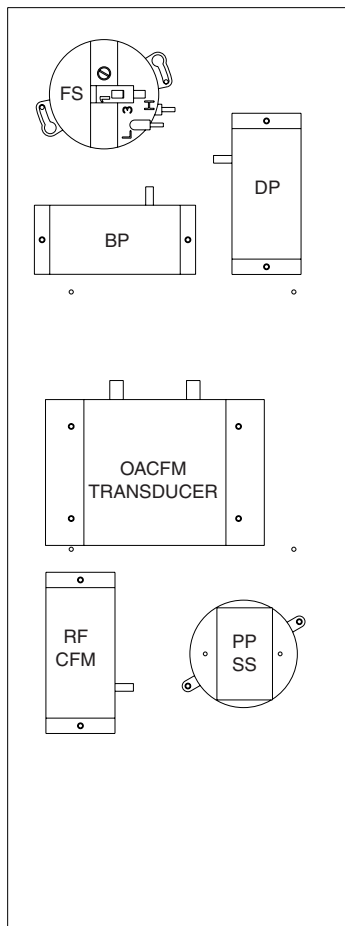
Auxiliary Control Box Details (Sizes 030-050)
